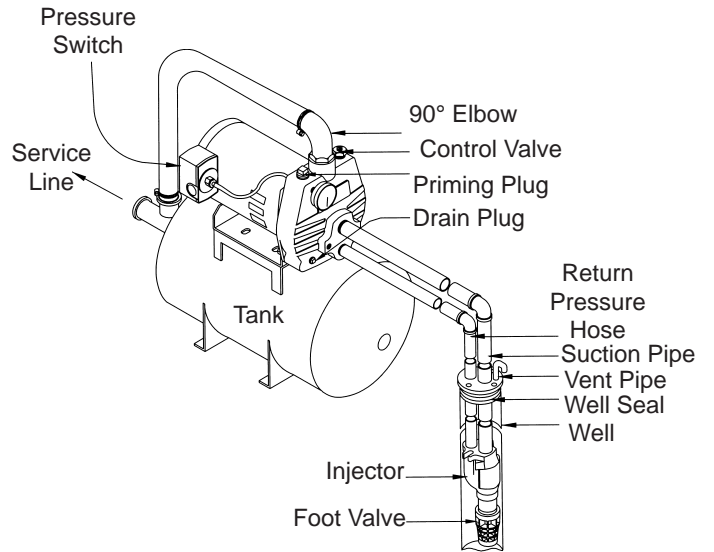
DEEP WELL - TANK MOUNTED SYSTEM (DOUBLE PIPE INSTALLATION WITH FOOT VALVE)
